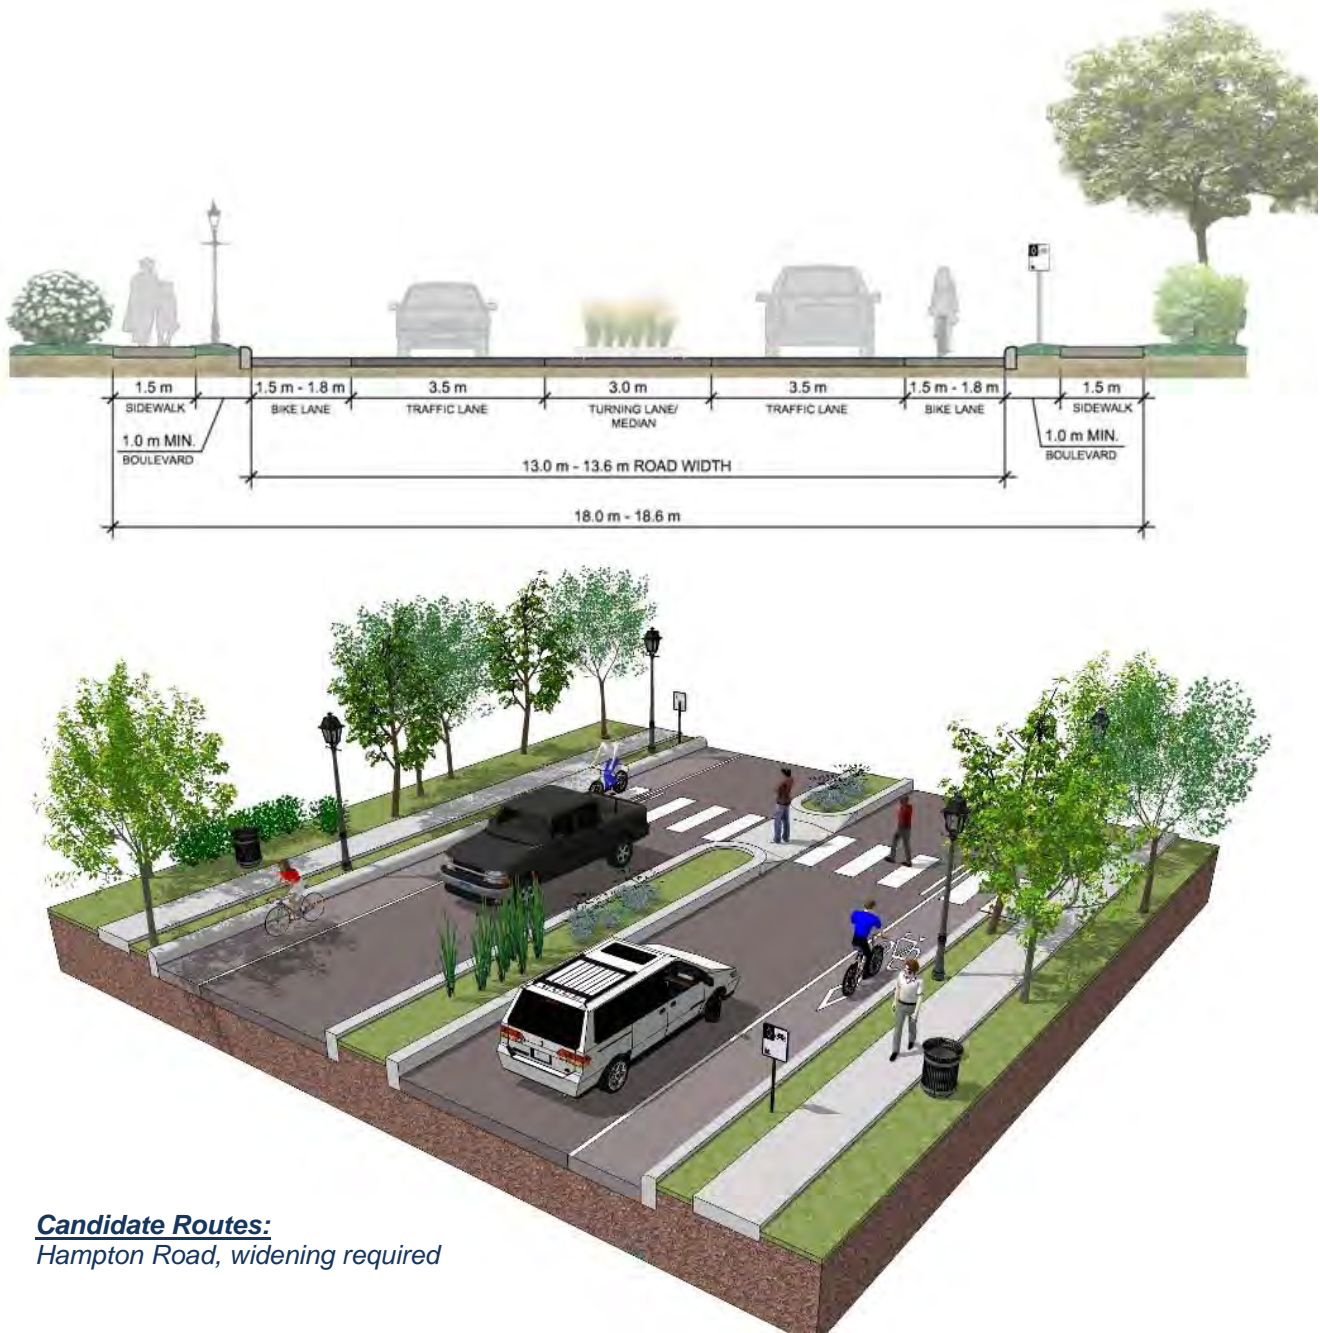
Modified (Retrofit) Standard: Two-Lane Collector Street with Bike Lanes
